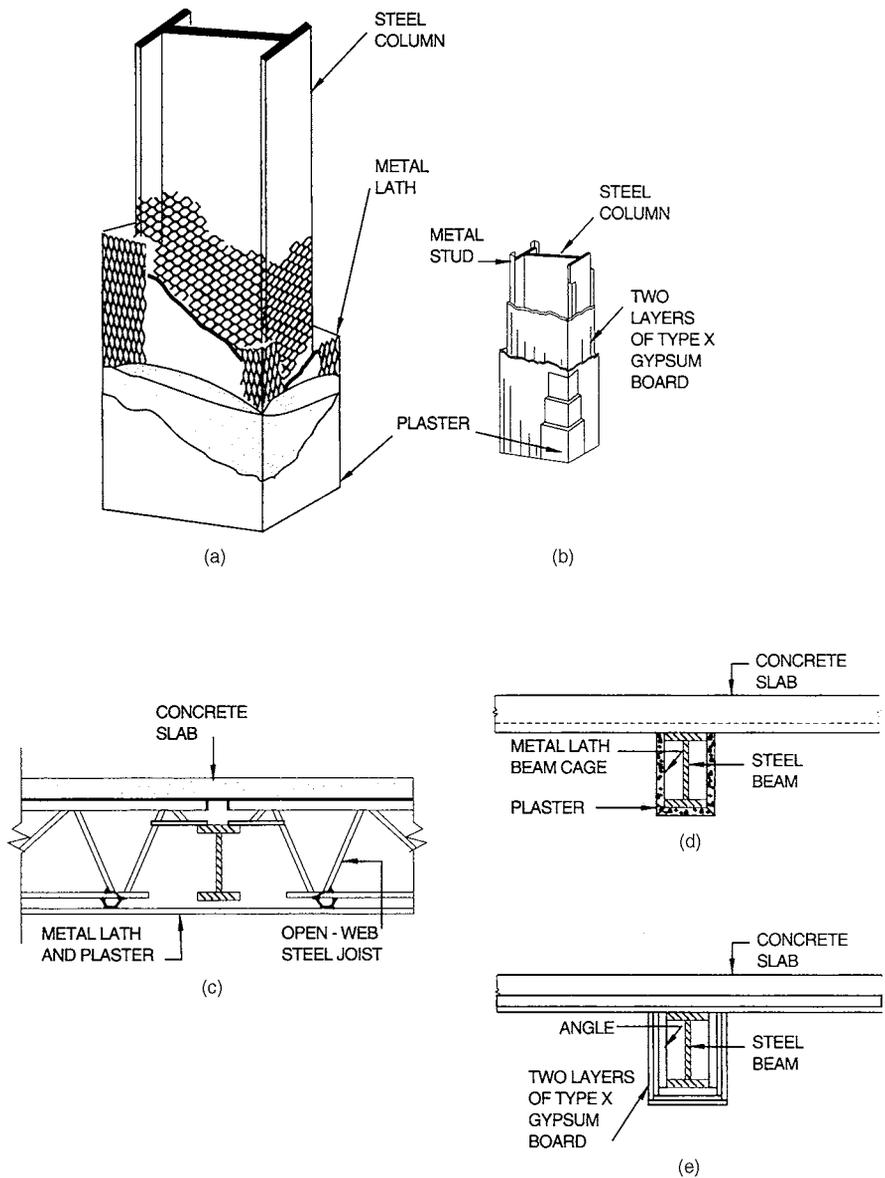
Some methods for applying gypsum as fire protection for structural steel: (a) column enclosed in plaster on metal lath; (b) column boxed in with wallboard and plaster; (c) open-web joist with plaster ceiling; (d) beam enclosed in a plaster cage; (e) beam boxed in with wallboard.
